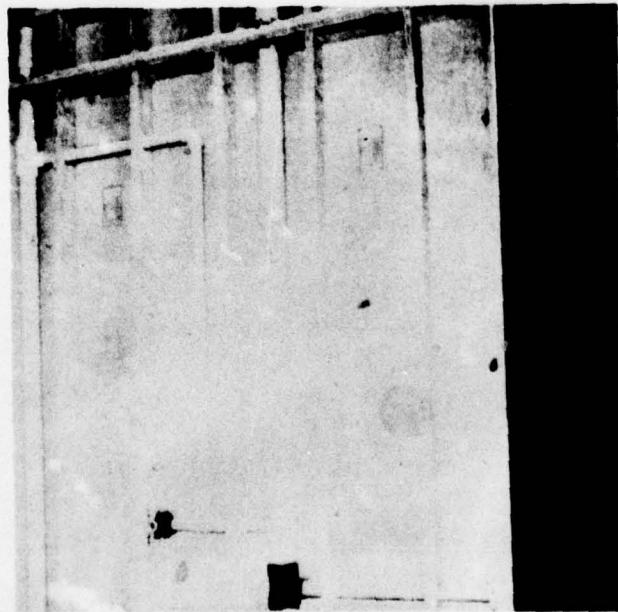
Shows typical DWV system in OSU tests before the gypsum wallboard had been installed on the exposed face. The black patches visible around penetrations were made with a commonly available furnace setting cement.
